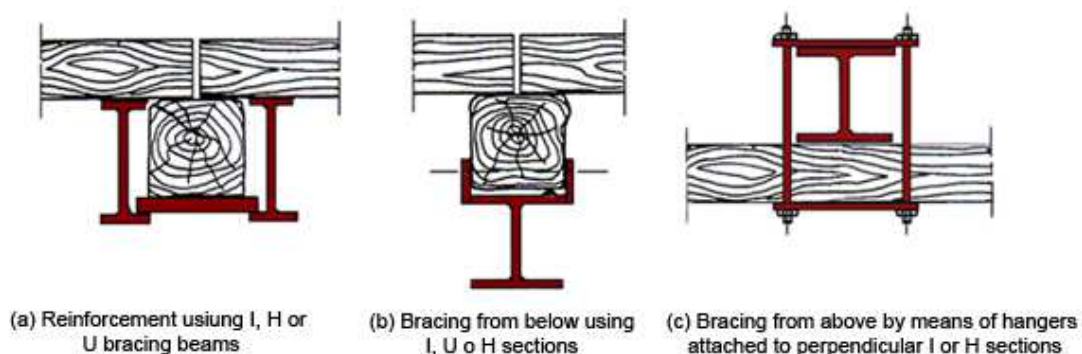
Reinforcement of wooden beams by addition of steel sections
